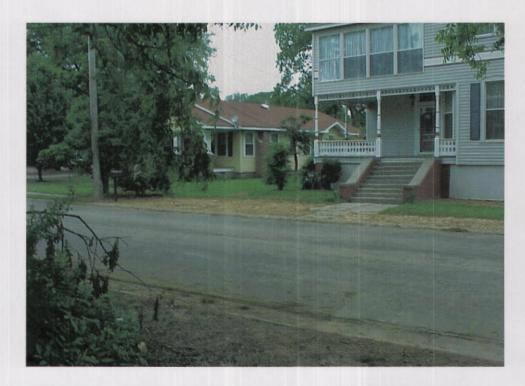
Completed excavation along Lee Avenue with backfill in-place. View is looking northwest across Lee Avenue.
